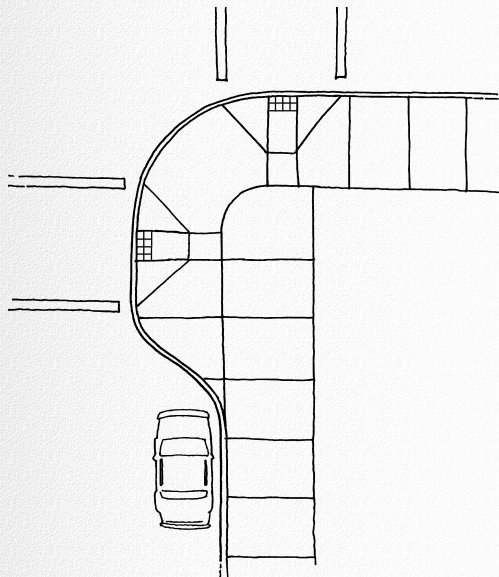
Curb extensions improve pedestrian visibility and provide additional space for level landings at curb ramps.
